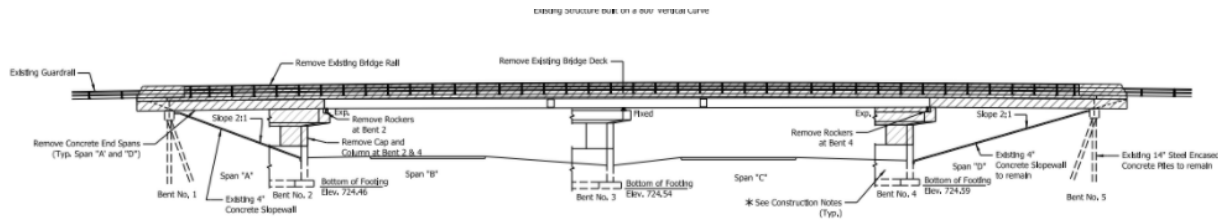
Elevation View of the Bridge (NBI 42020) (2016)
